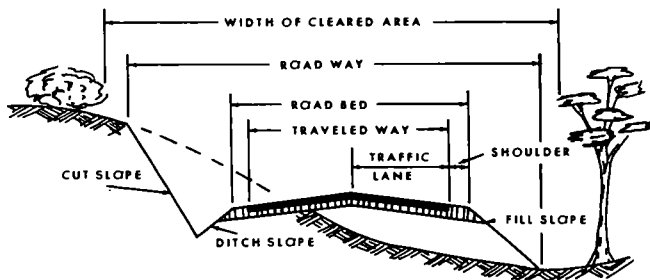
Typical cross-sections illustrating road nomenclature.
